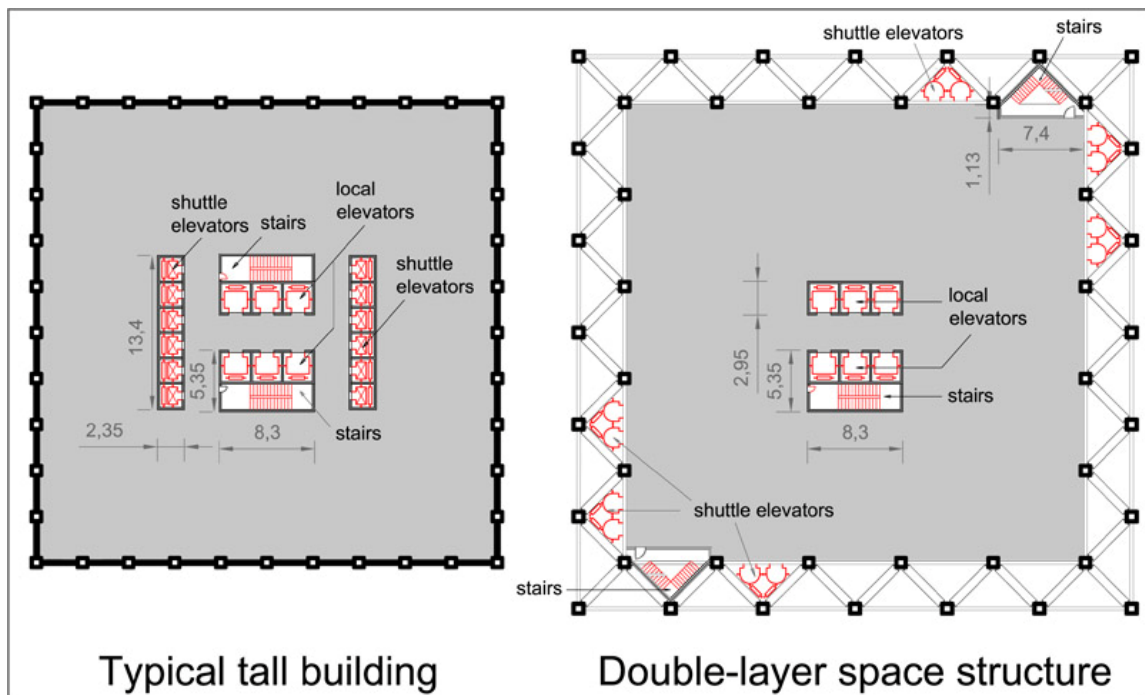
Usable areas of a typical tall building and double-layer space structure building
